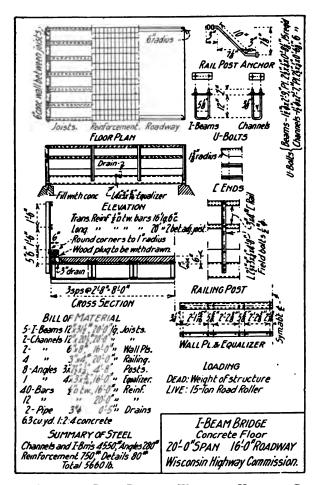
STANDARD BEAM BRIDGE. WISCONSIN HIGHWAY COMMISSION.
